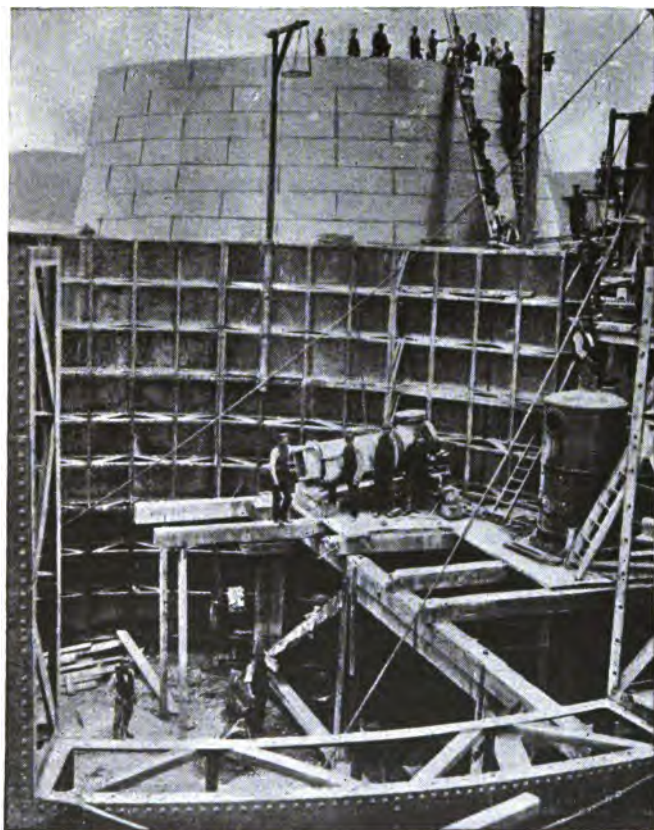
Construction of temporary caisson, Forth Bridge. In the background is seen a complete caisson.
